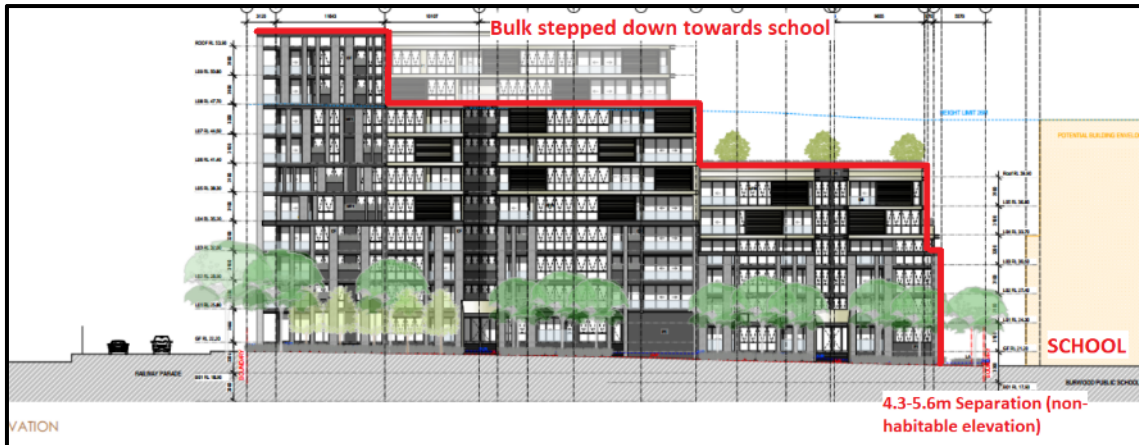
Marked amended northern elevation showing the stepped down bulk to minimise impacts on adjoining school (Source: Alexandar Design Group, 2018 / Marked: James Arnold, 2018)
